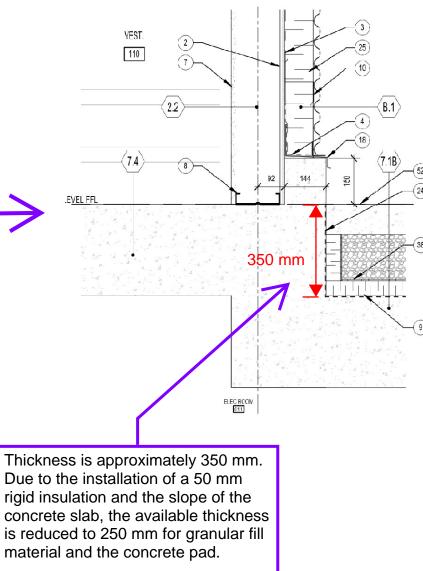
Cross Section of The Proposed Electrical Room in The Basement
